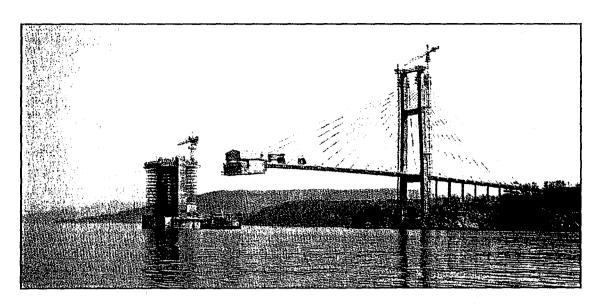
ERECTION OF THE CABLE-STAYED SPAN (Courtesy of McGraw-Hill, 1994)
